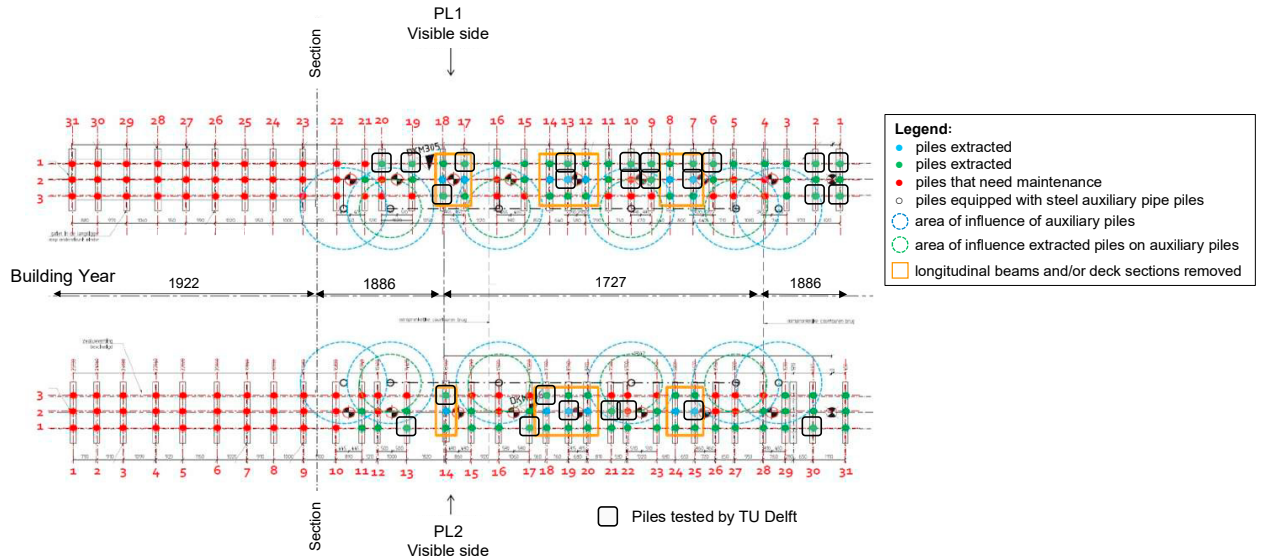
Plan of piles layout of Bridge 30 in Amsterdam. Image courtesy of the municipality of Amsterdam.
